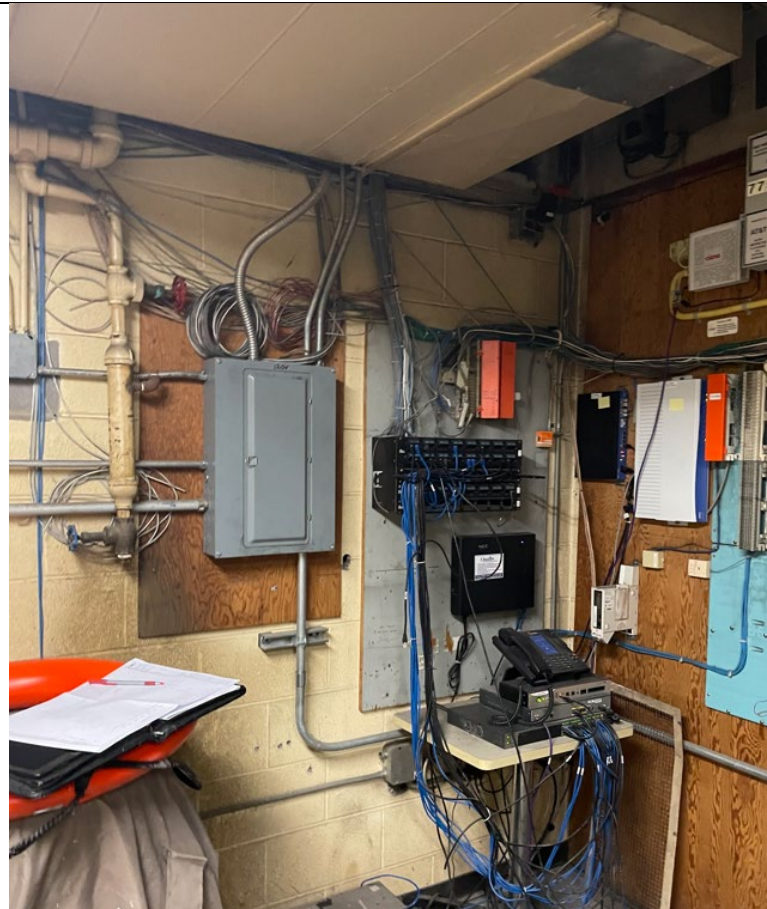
Communications utilities and IT racks are in first floor mechanical/storage room in two story office addition
